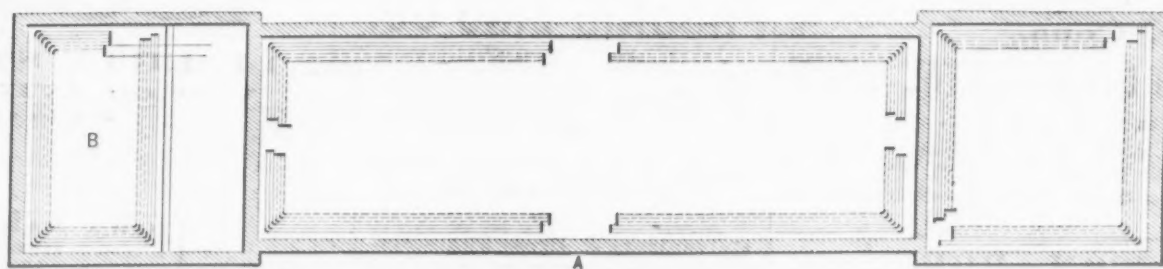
Plan of Piping, First Floor, West Front of Building.
